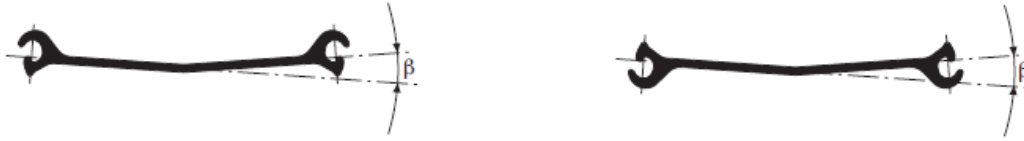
Bent Piles (ArcelorMittal, 2008)
